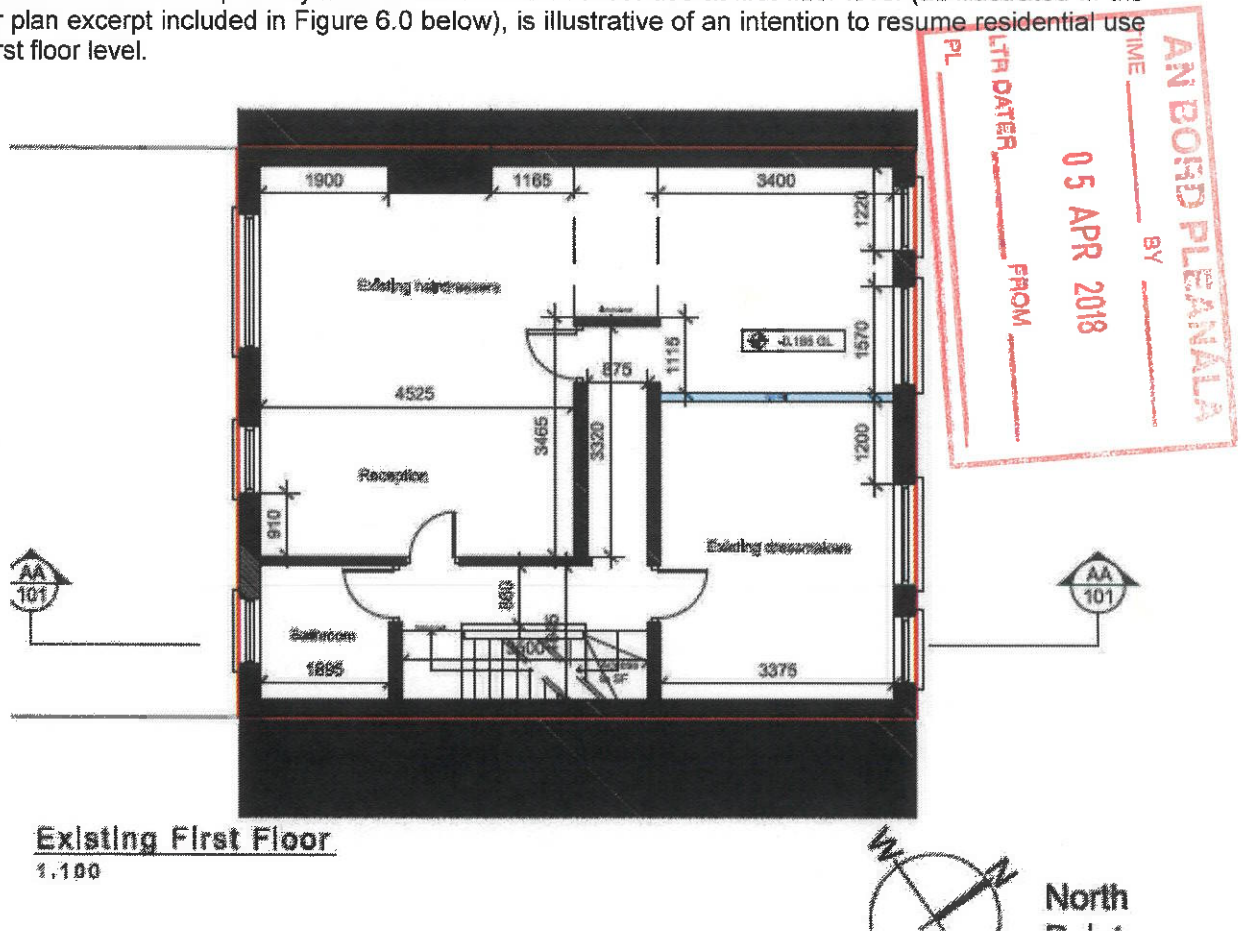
The layout of the buildings first floor plan at the time of purchase in 2016
